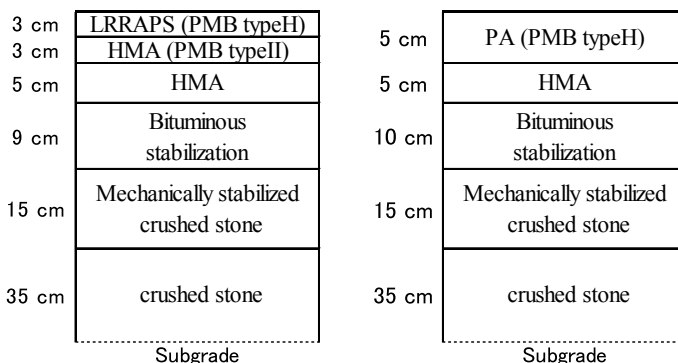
Cross-sectional view of asphalt pavement used for the estimations
